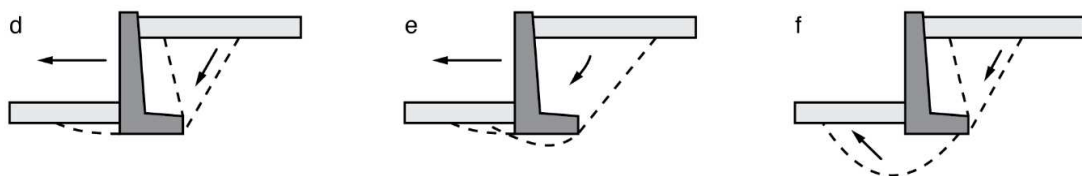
GEO Foundation failures of gravity walls (based on Fig 9.2, EN 1997-1:2004)
